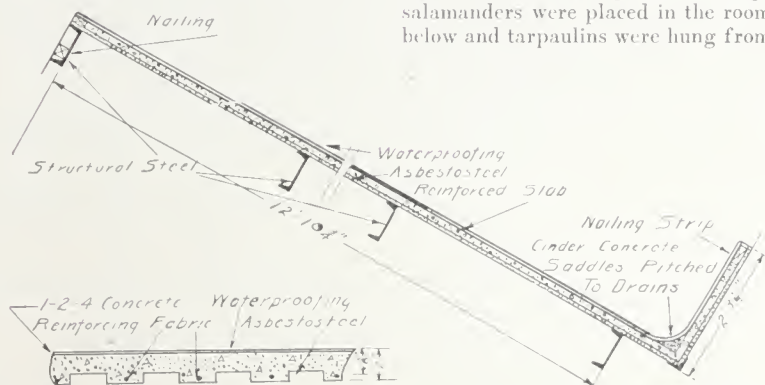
STRUCTURAL DETAILS SHOWING THE ARRANGEMENT OF THE ASBESTOS STEEL, CONCRETE SLAB, STRUCTURAL STEEL PURLINS AND GUTTER DETAILS
